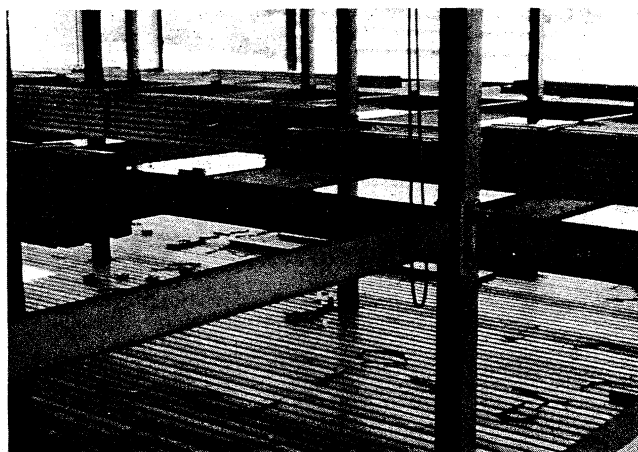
Interior of G. S. A. office building, showing moment connections for beam-girder connection and moment connections at column
